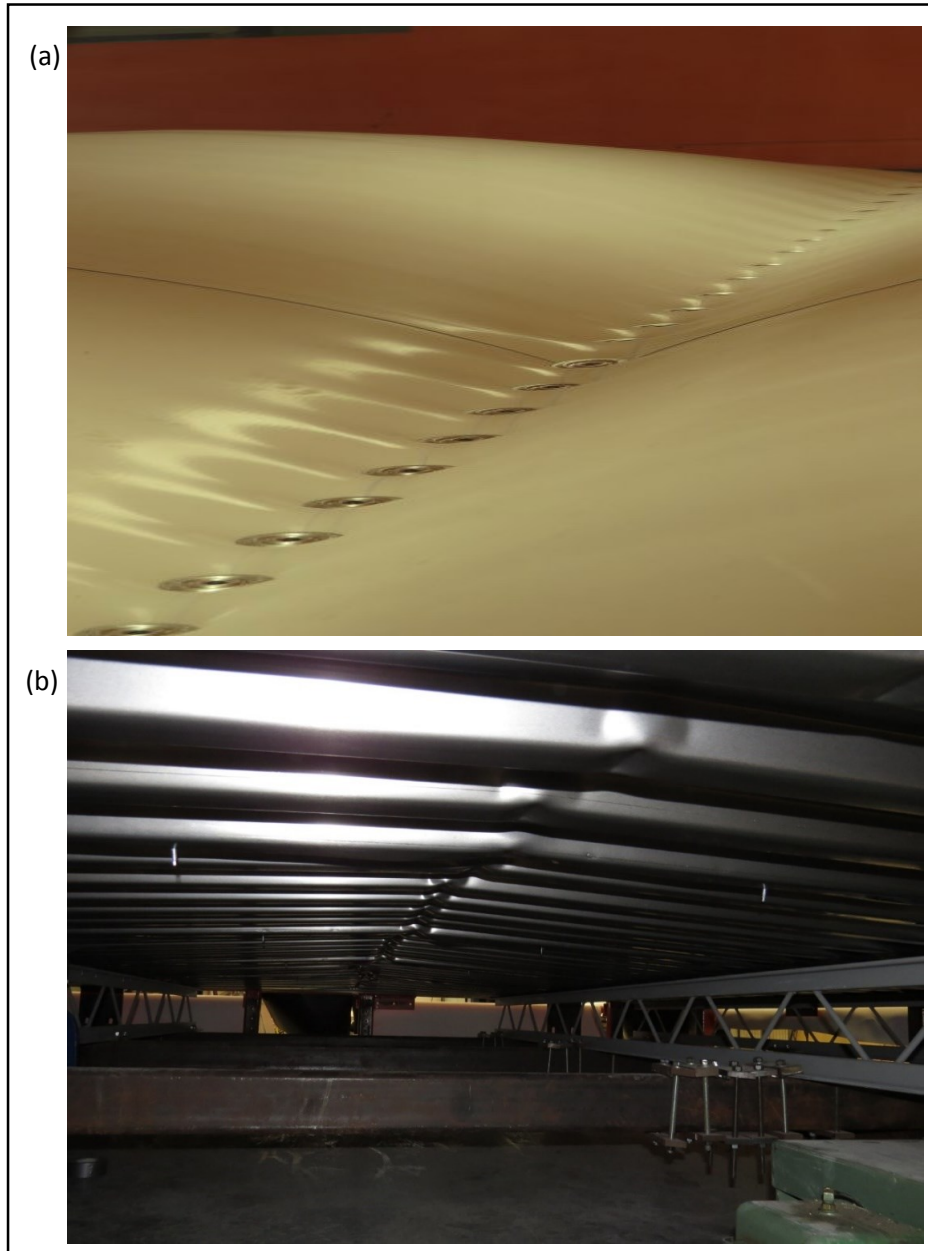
(a) Roof assembly under 130 psf pressure, (b) Buckling in mid-span of steel deck
